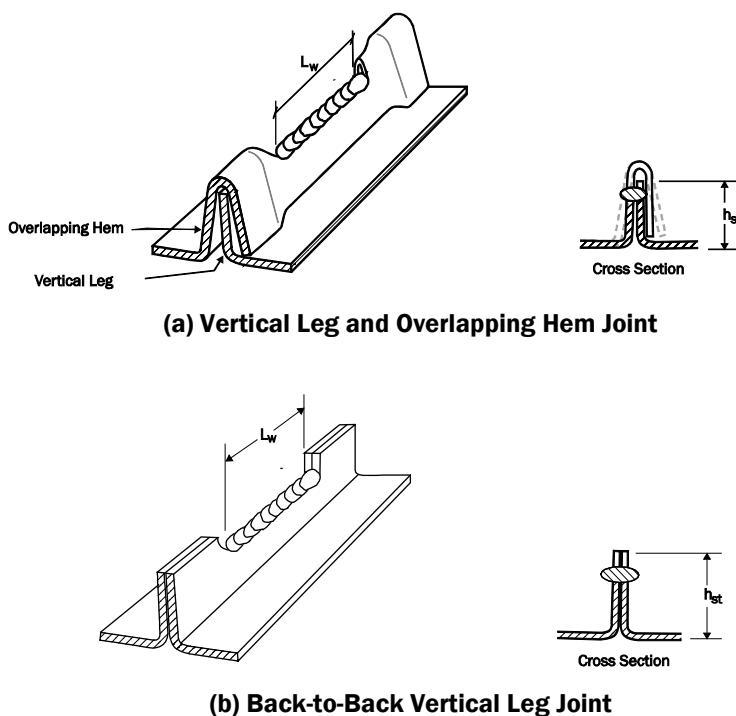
Top Arc Seam Side-Lap Weld
